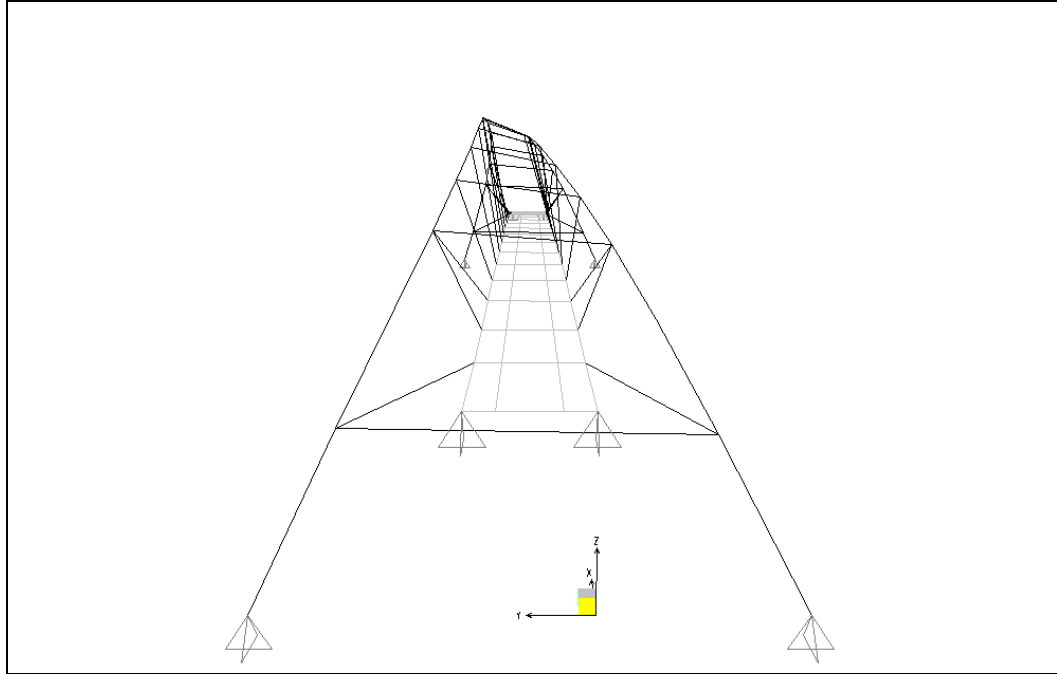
Deformed view for WIND3 looking down the walkway of the structure.
